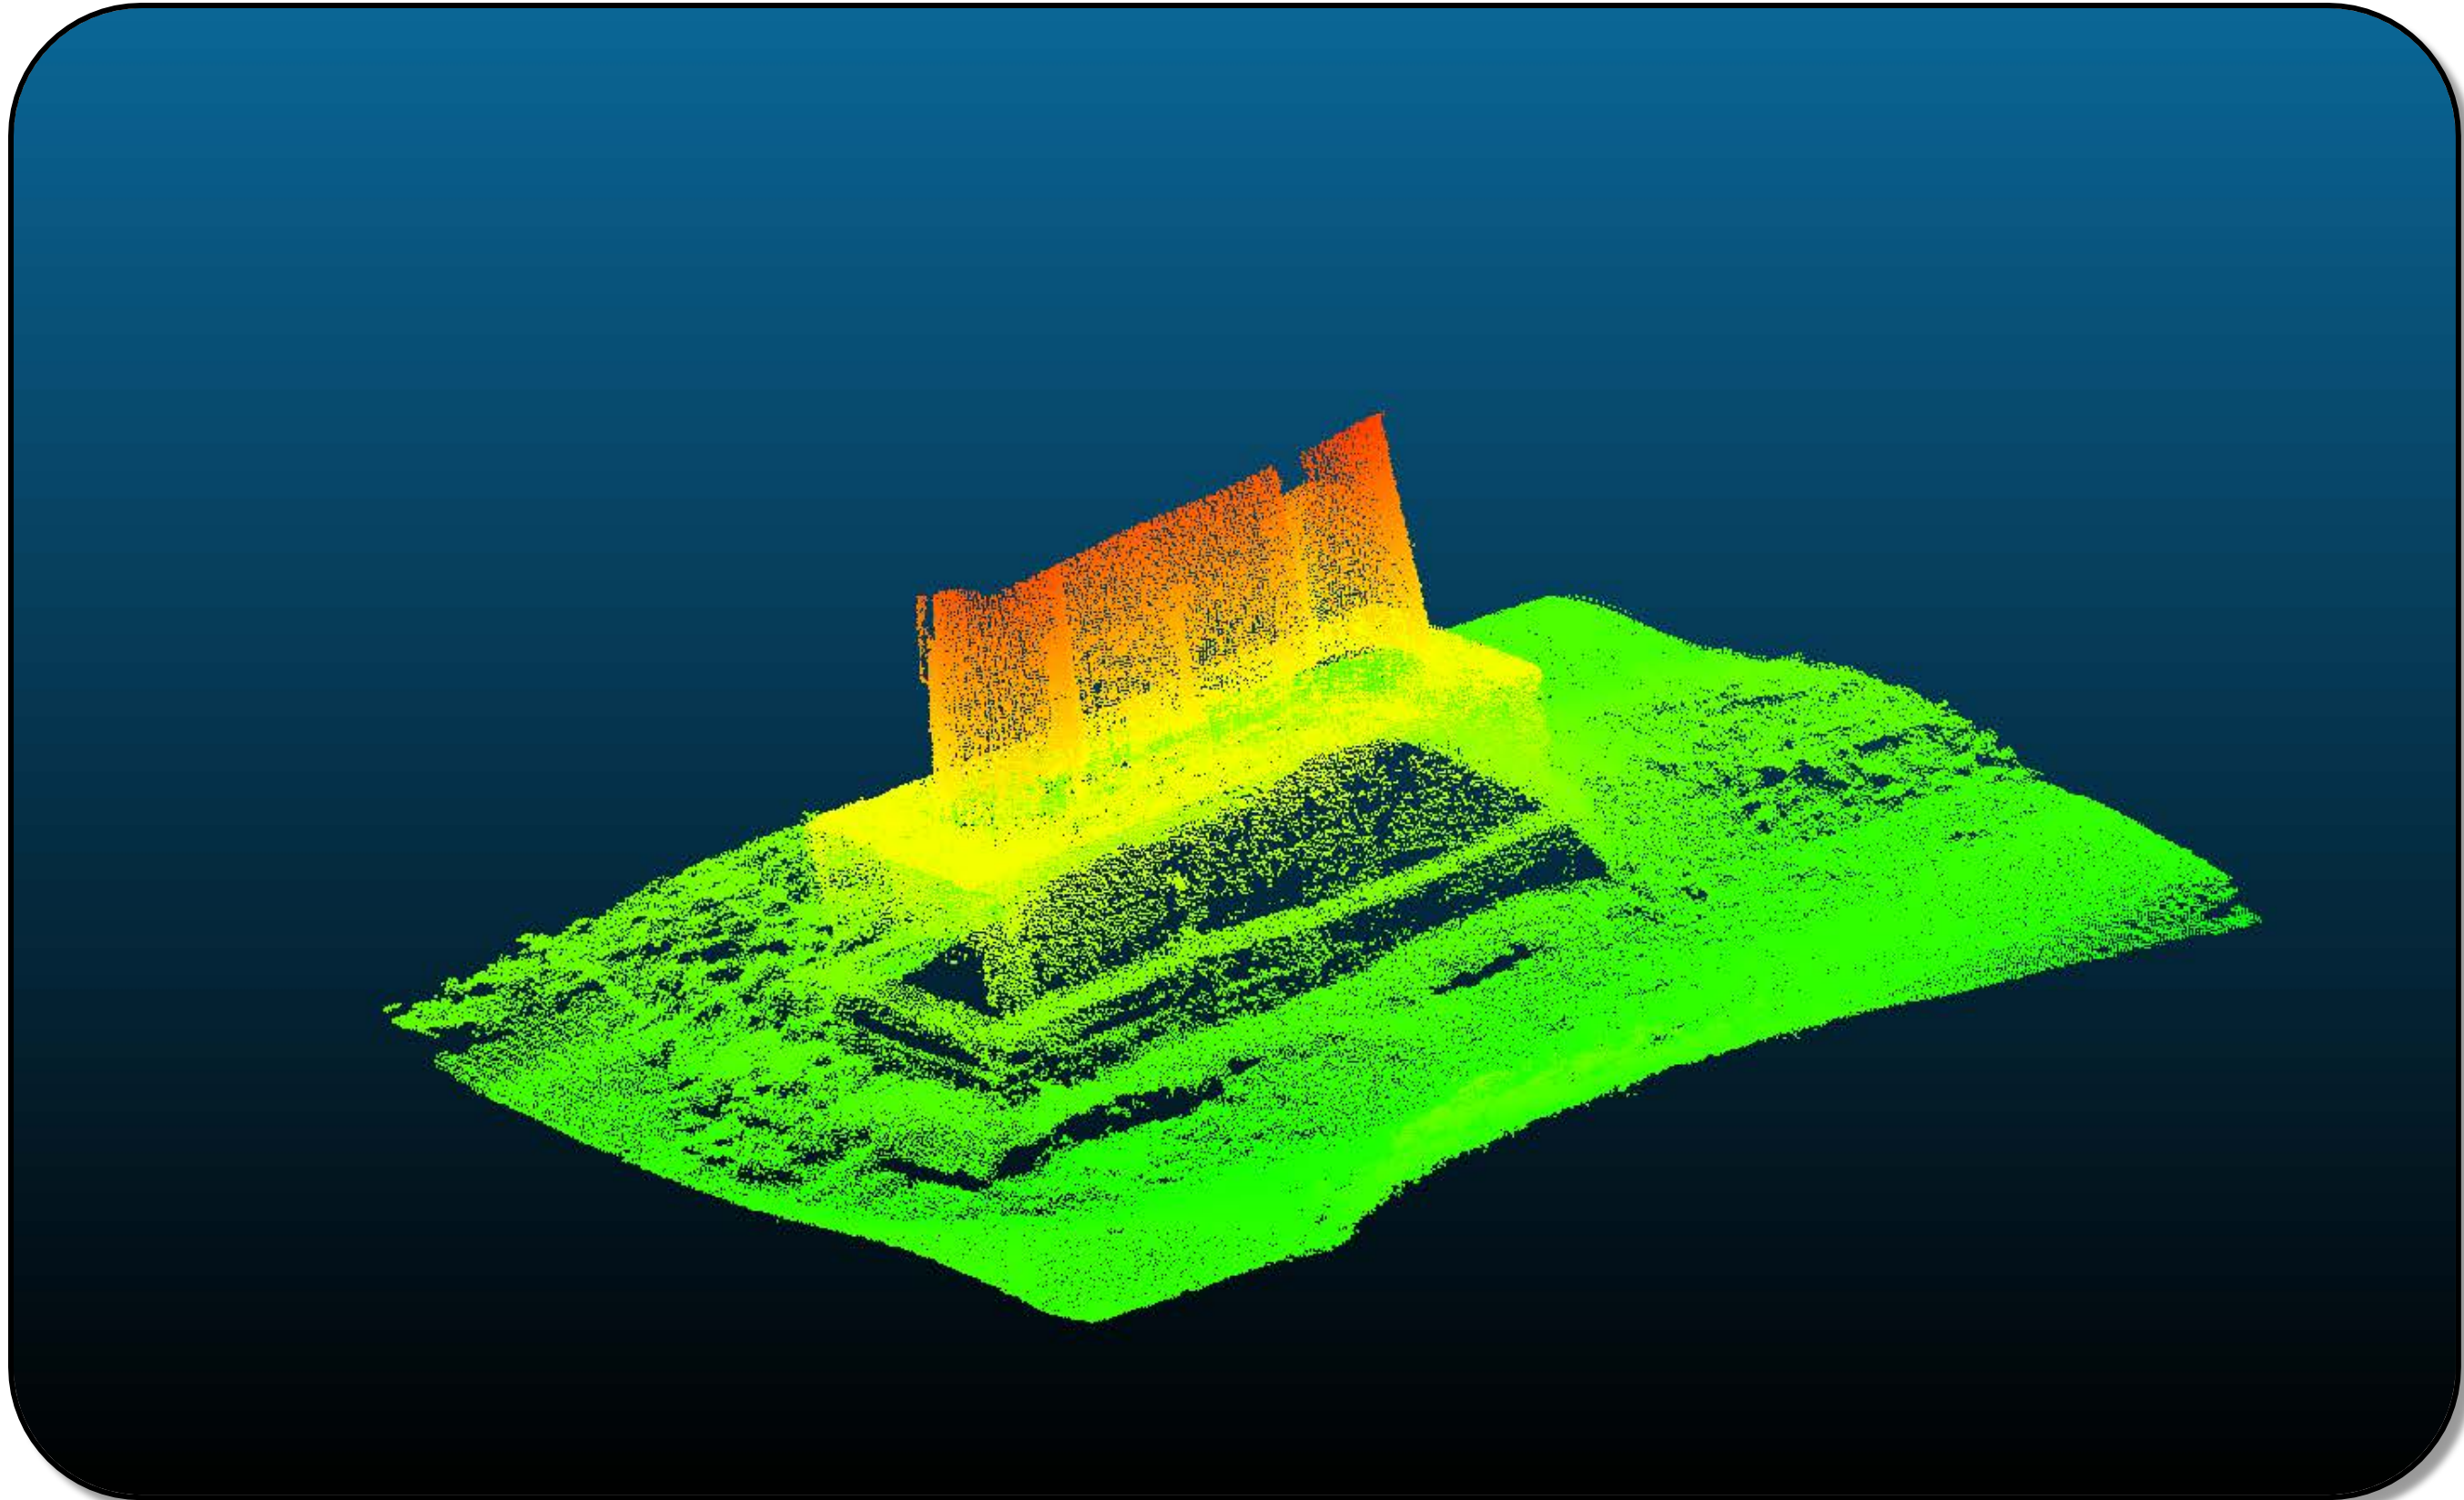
Perspective view of Pier 14 point cloud (looking from the northeast direction).
